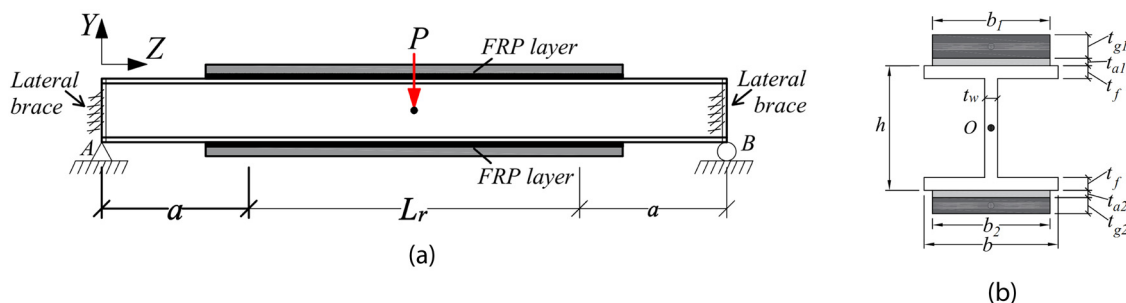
Profile (a) and cross-section (b) of the FRP layer-bonded steel beam in Example 1.
